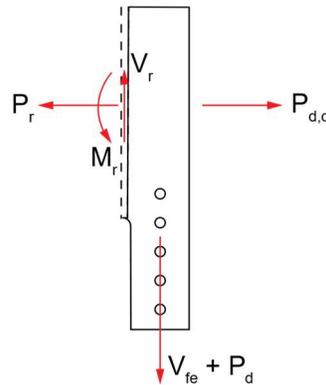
Special external continuity plate with a cut at the cover plate section.
